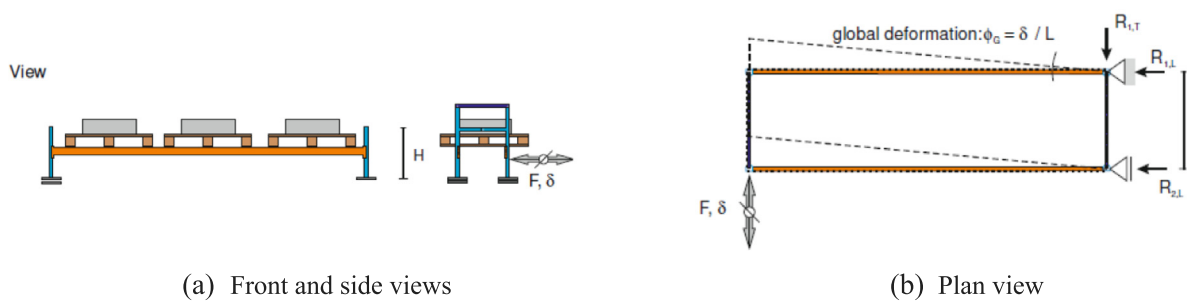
Subassembly testing setup in cross-aisle direction [3].
